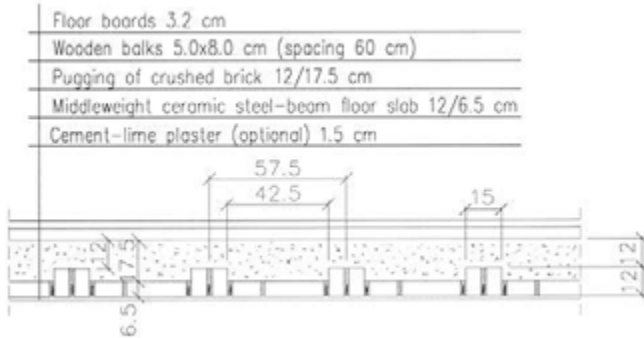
Cross section through the ceramic slab of a steel-beam floor
